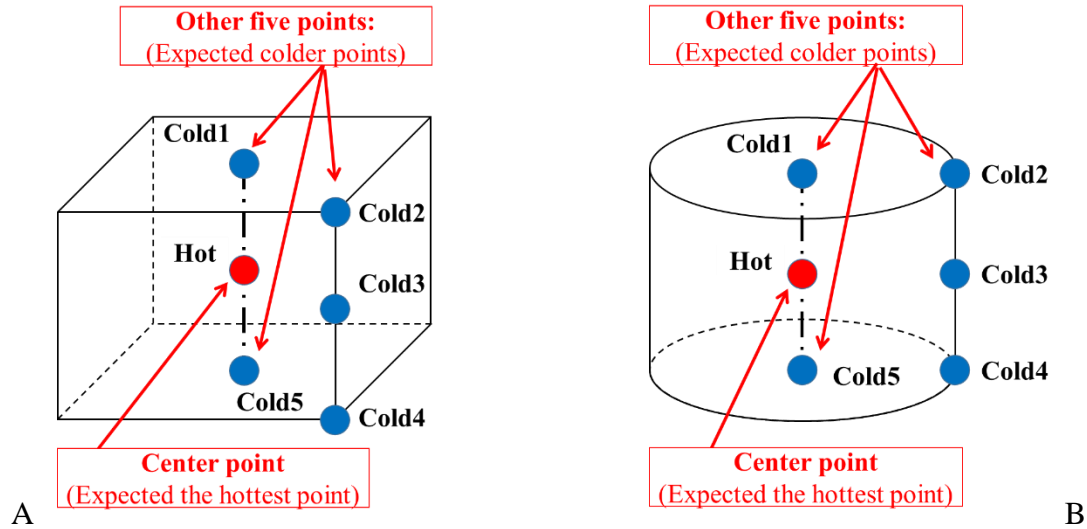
Locations of coldest and hottest points in rectangular footing and drilled shaft. A) rectangular footing and B) drilled shaft.
